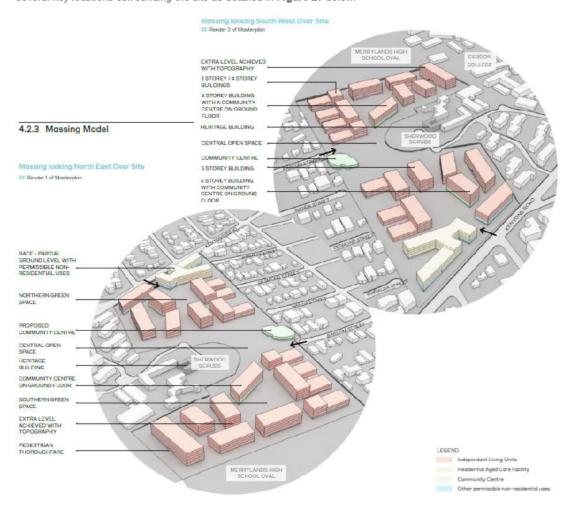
Massing model of the indicative concept masterplan proposal (source: Ethos Urban)
